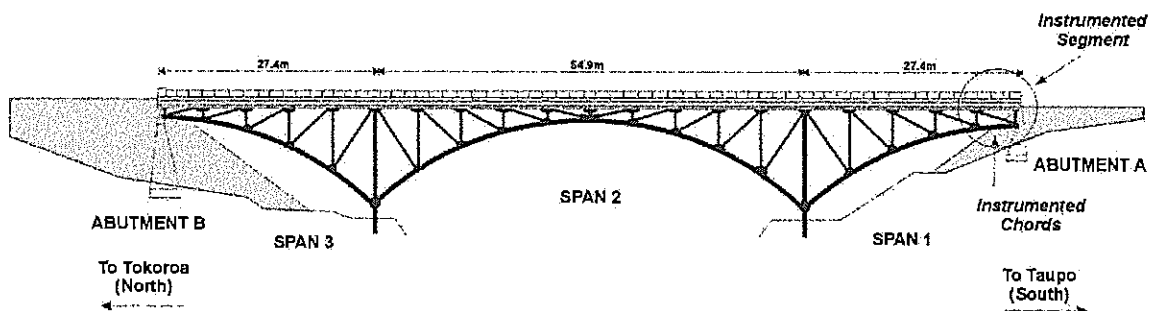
Elevation of the Atiamuri Bridge showing the position of the instrumented segment of the truss.
